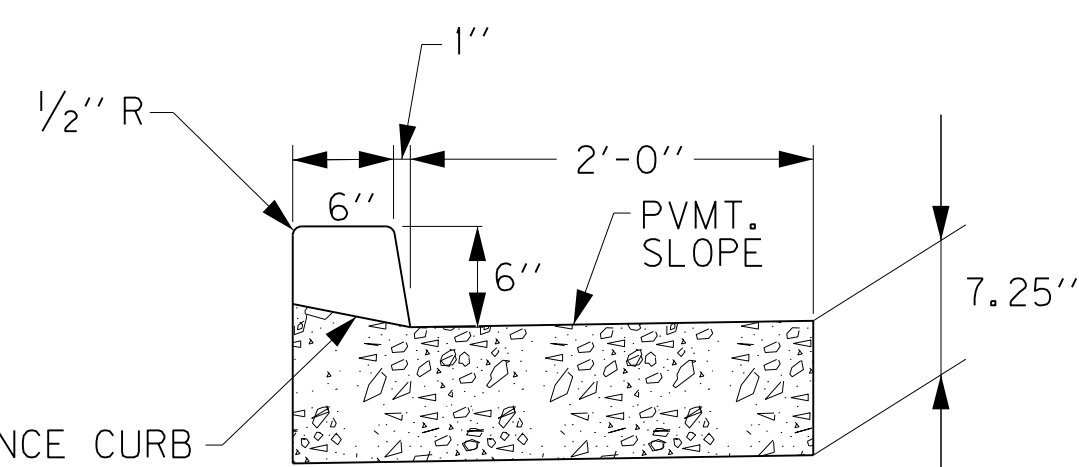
DETAIL "E" MULTI-USE PATH UNDER TRAFFIC
